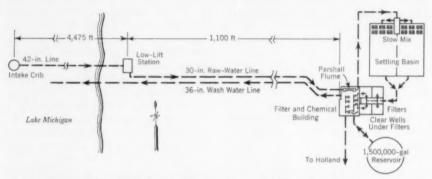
Schematic Plan and Flow Diagram of Holland Treatment Plant
